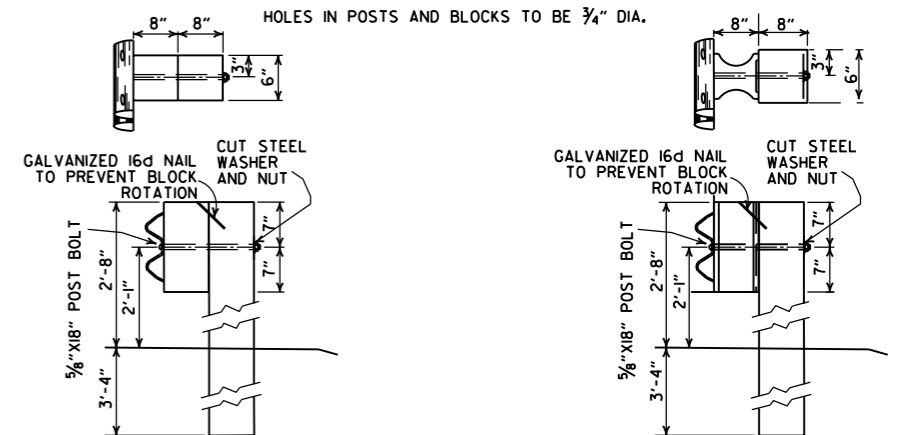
DETAILS OF STEEL LINE POST CONNECTIONS (W-BEAM)
